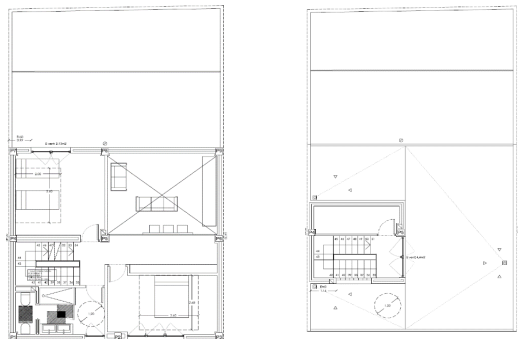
Plans of the house part 2: Third and fourth floor section. Source: Own source
